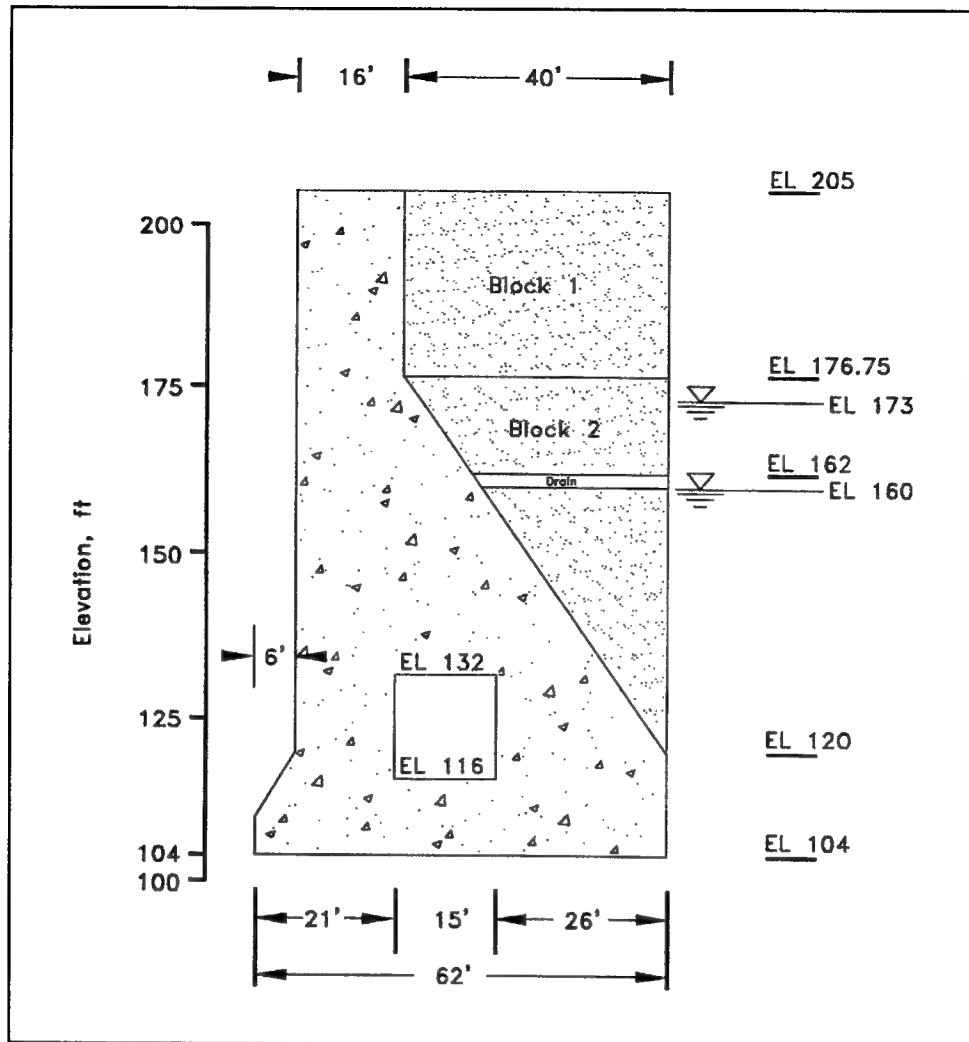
The cross section of Snell Lock Monolith N-56 (1 ft = 0.305 m)
